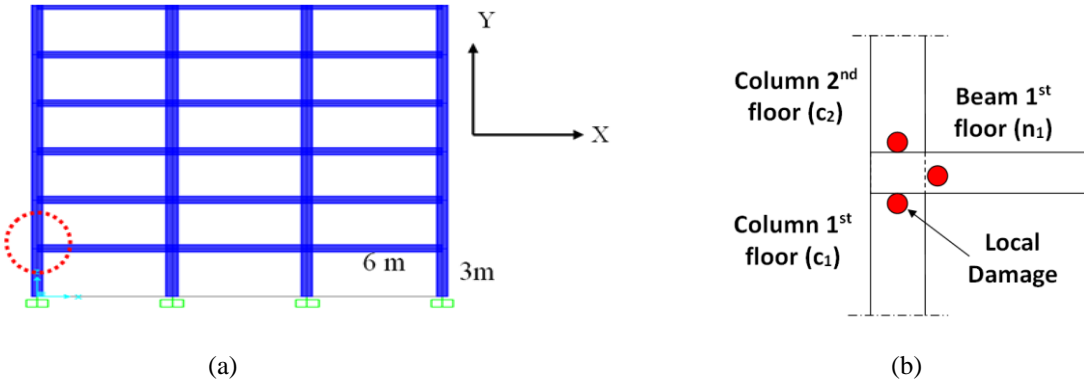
(a) Typical composite building frame and (b) beam-to-column joints of 1st floor with damage points.
